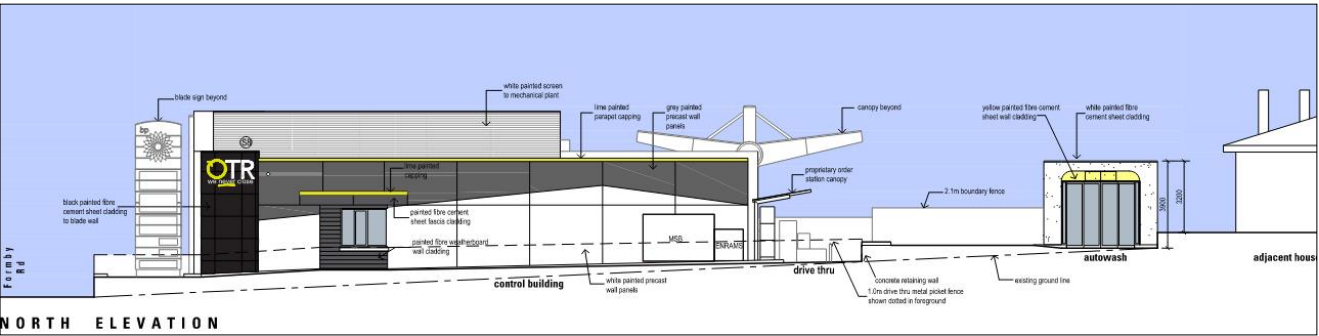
Northern elevation from Elizabeth Street (Source: Ratio)
